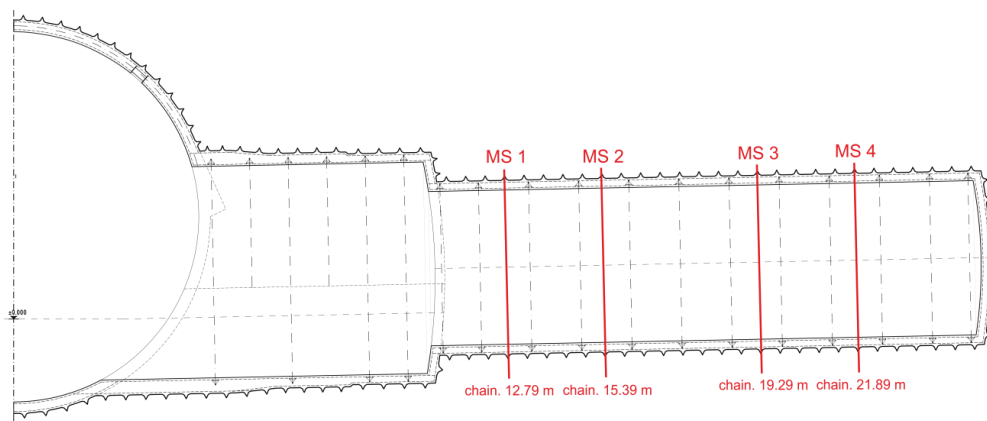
Longitudinal section of the instrumentation adit and the test cross sections MS 1 – MS 4.
